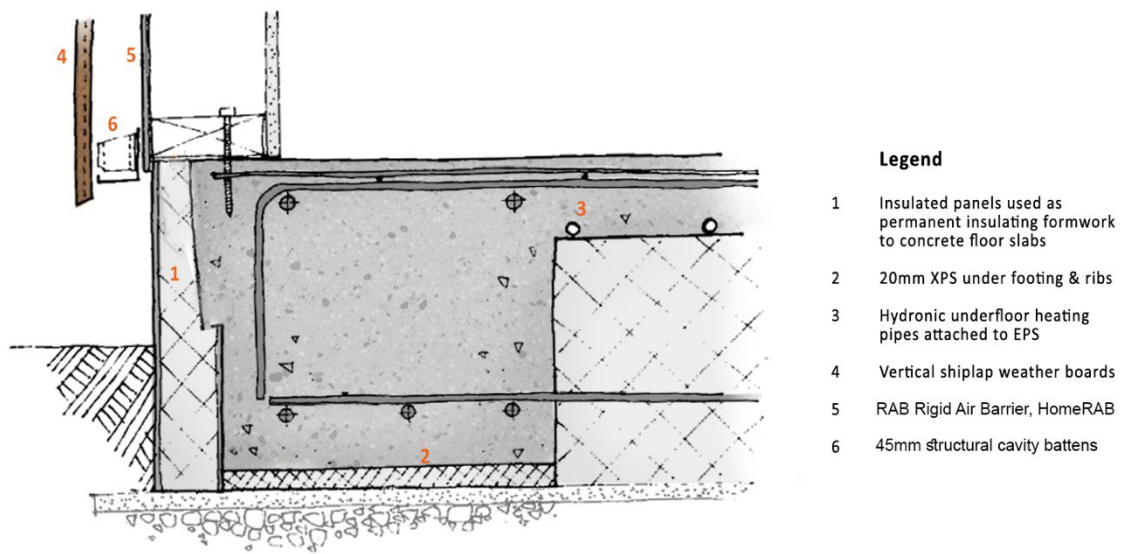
Illustration of foundation details showing 140mm framing and slab edge insulation
